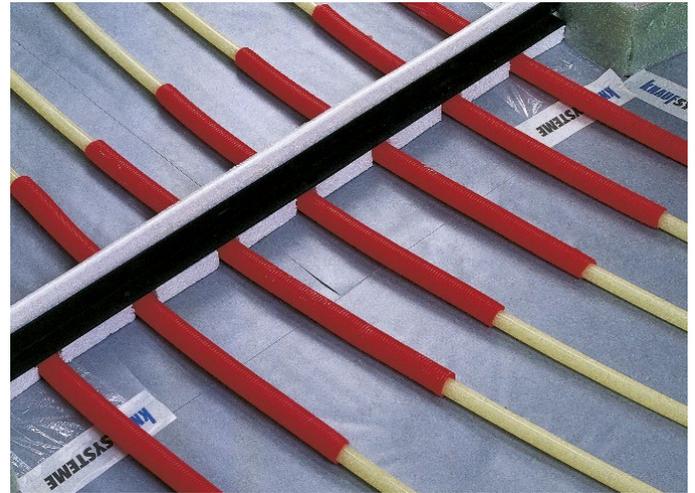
Movement joint in a heating floor screed, type A on door passageways
